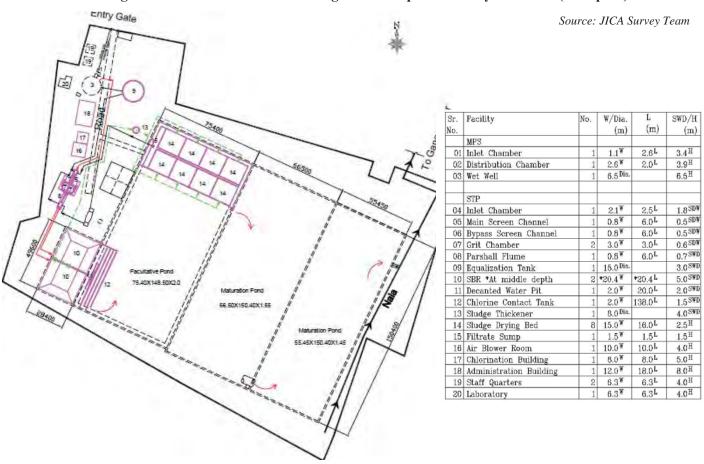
Layout plan of Proposed Vindhyachal STP (SBR plan)
